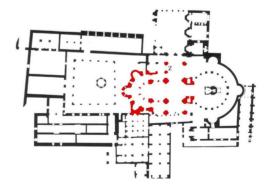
Holy Sepulchre, crusader new choir, Jerusalem, 1099-1149, plan (Burke, 2002).
